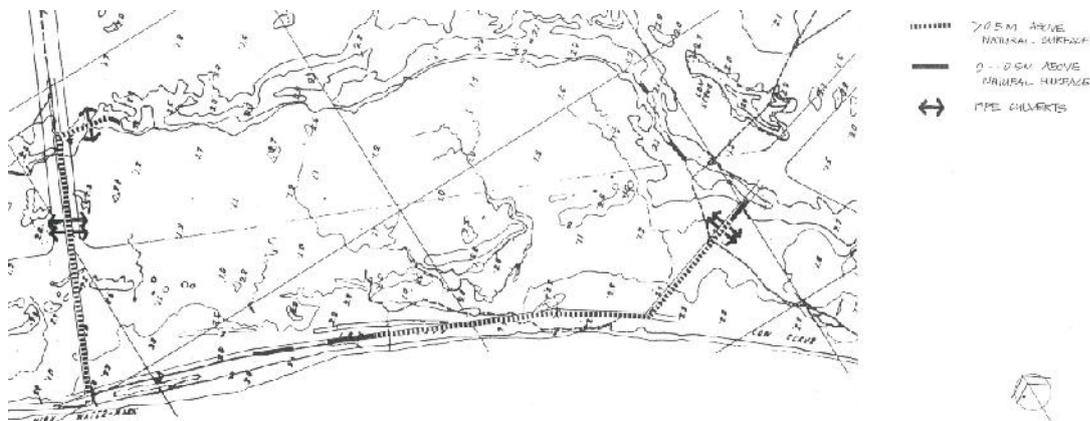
The levee plan from the EIS Supplement shows that a vast proportion of the levee bank was to be installed at the > 0.5m above natural surface, ie construction method 2.
